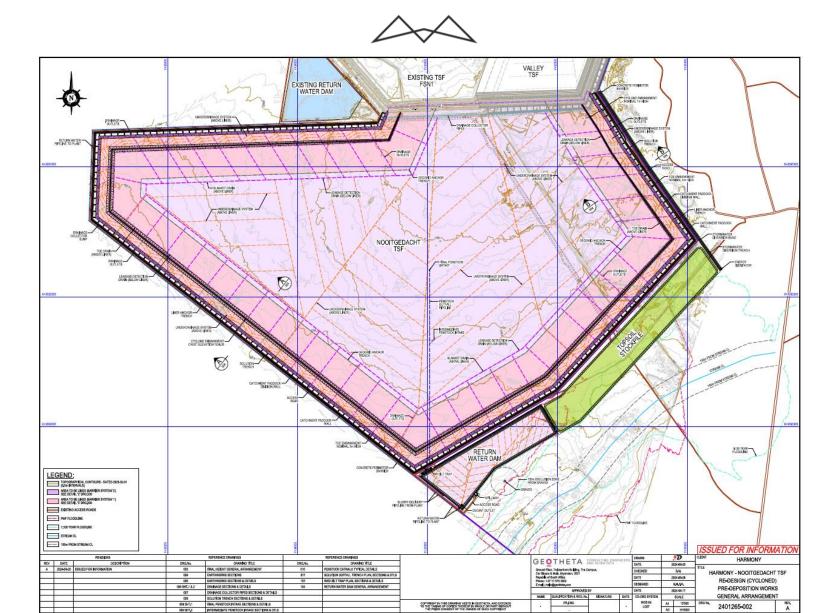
Preliminary general arrangement of the proposed Nooitgedacht TSF
